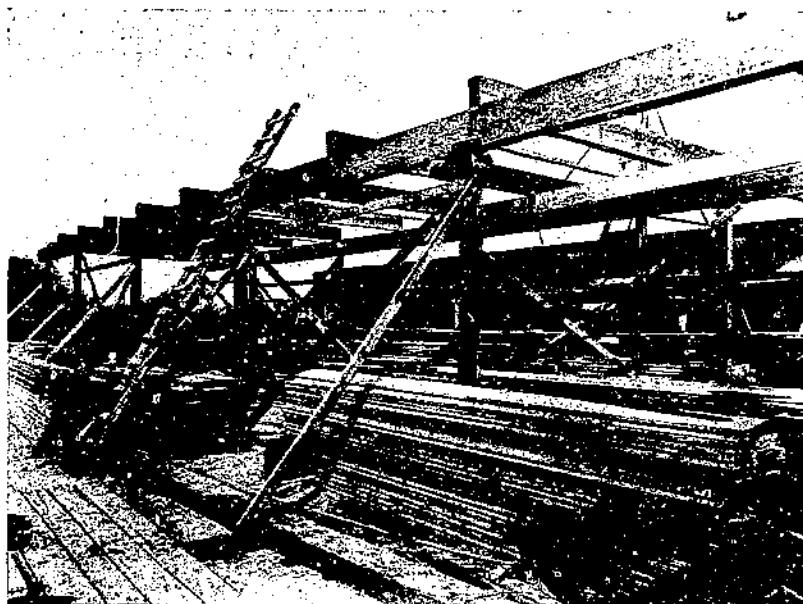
Piles of heavy, tongue-and-groove white fir flooring awaiting installation in a factory.
